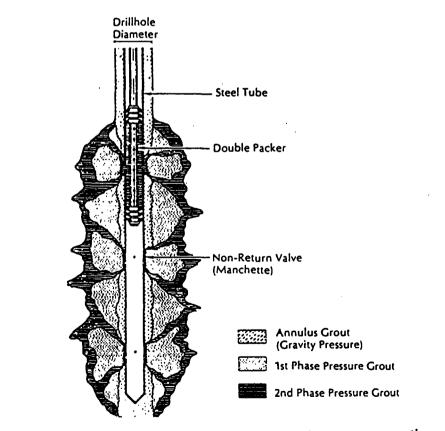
Use of reinforcement tube as a tube à manchette post-grouting system (schematic) [Mascardi, 1982].
